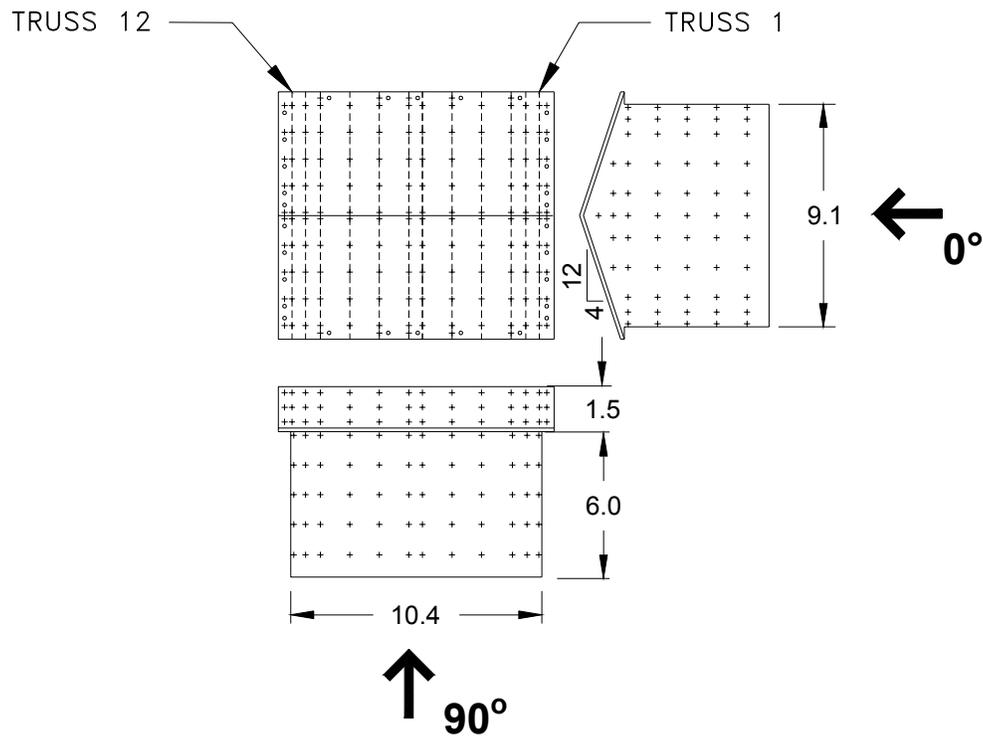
Exploded view of wind tunnel model, illustrating pressure tap and assumed truss locations. All dimensions are in full-scale metres.
